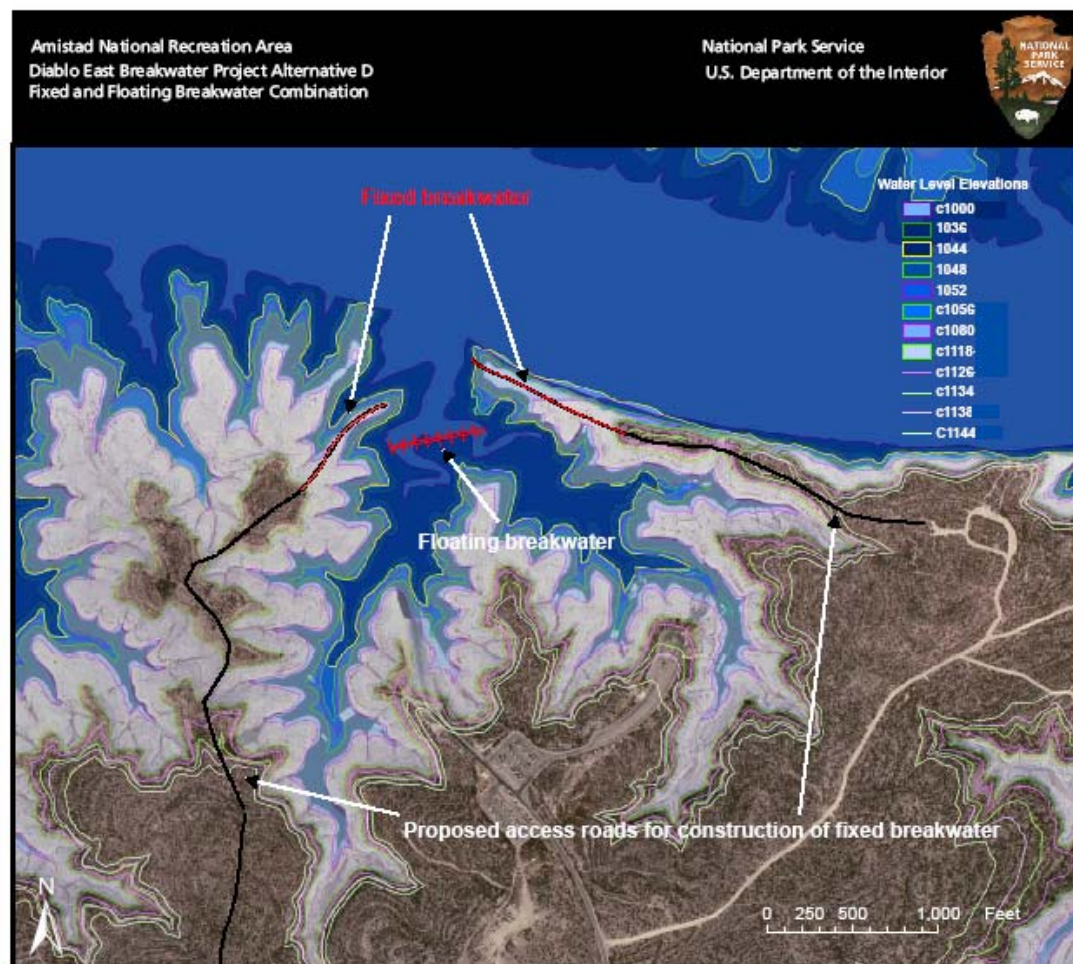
Alternative D showing the proposed location of a fixed and floating breakwater.
